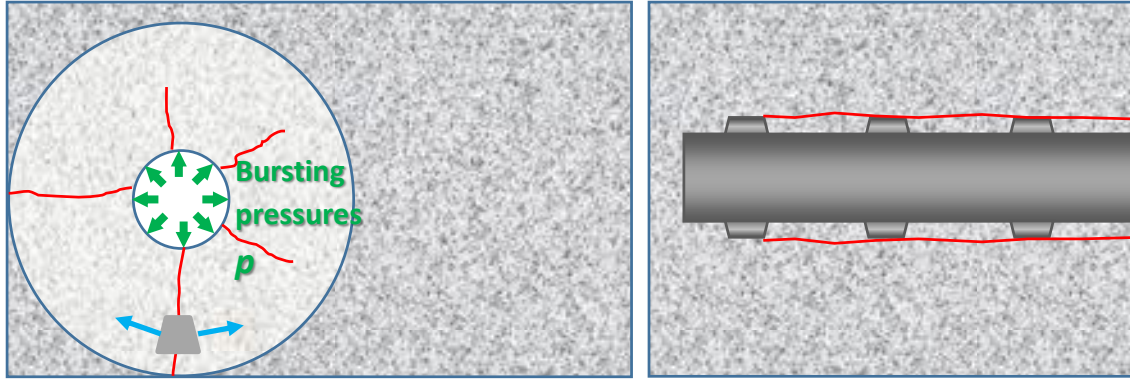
Illustration of the splitting failure (a) and pullout failure (b).
